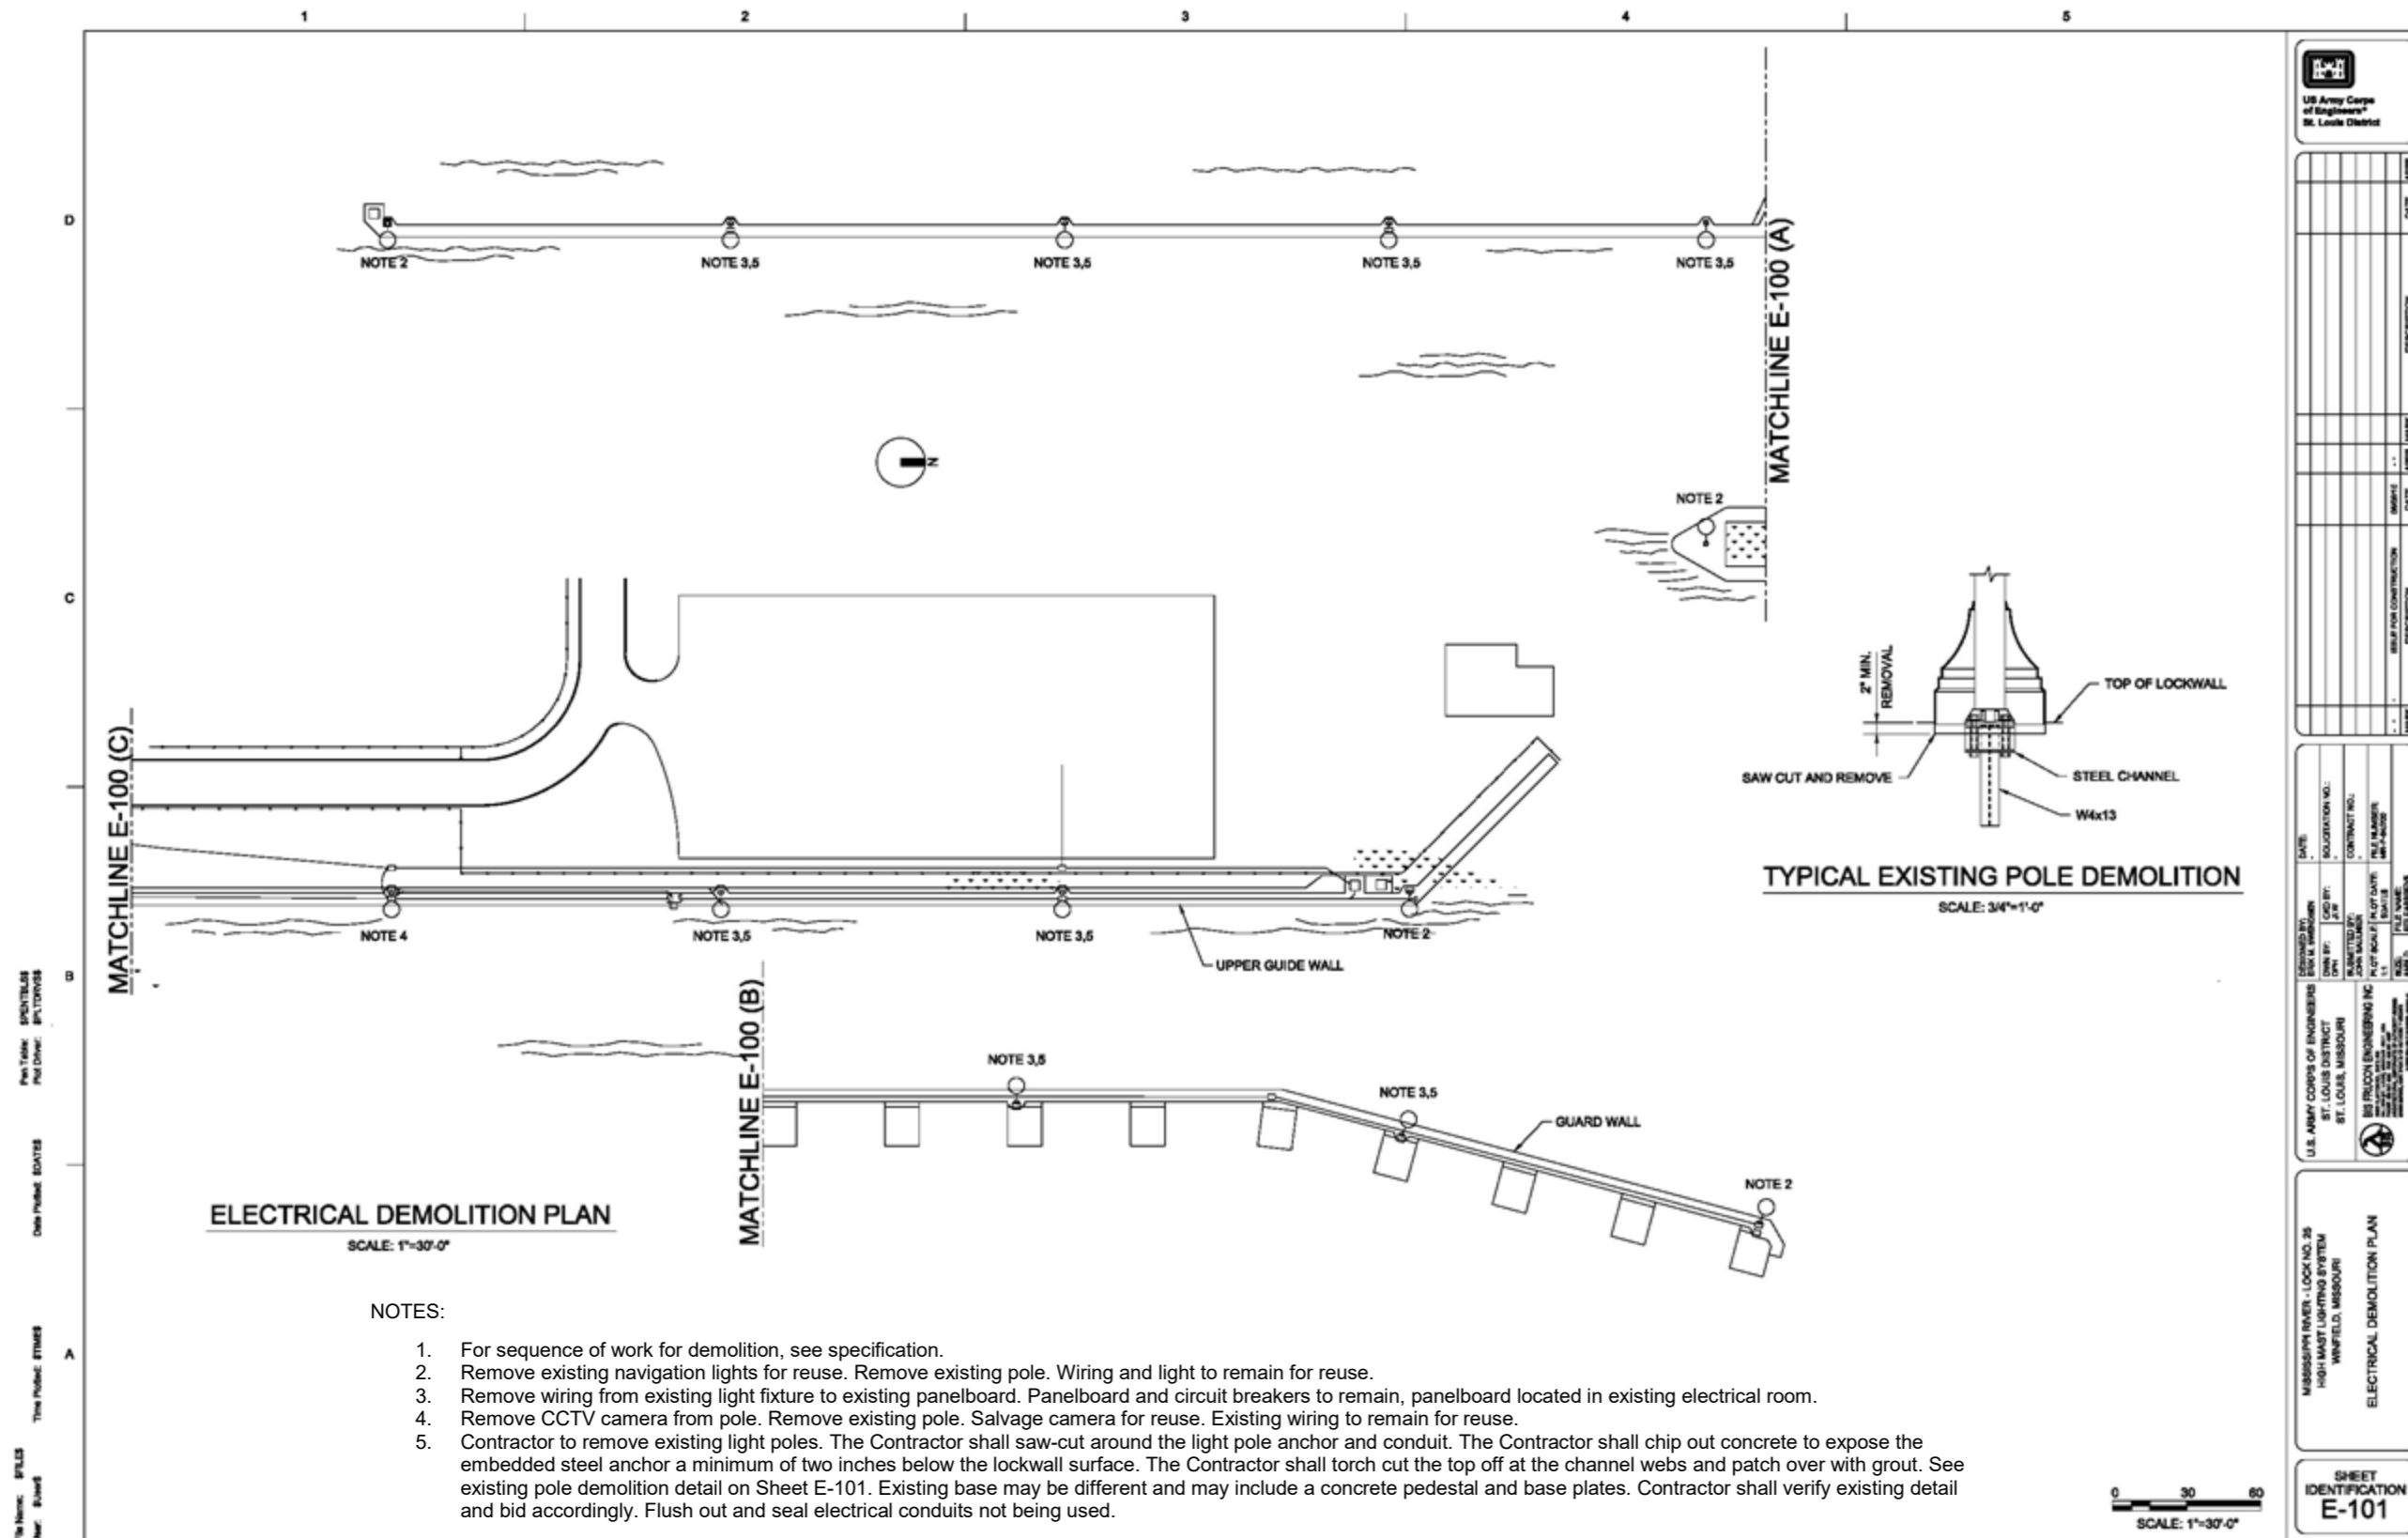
L&D No. 25, existing light pole layout, Sheet 2.
